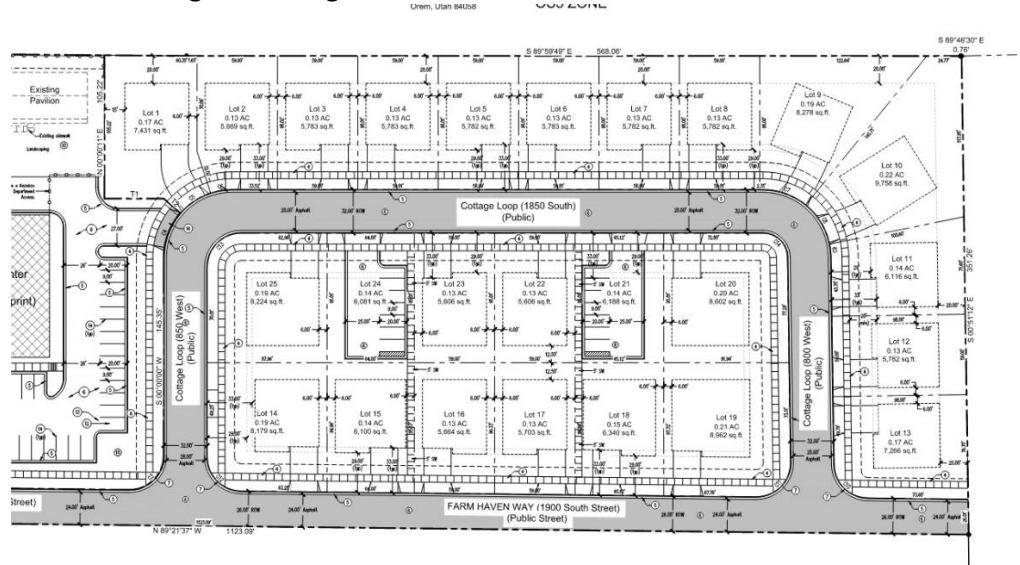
Existing Site Plan, Farm Haven (cottage lots)
